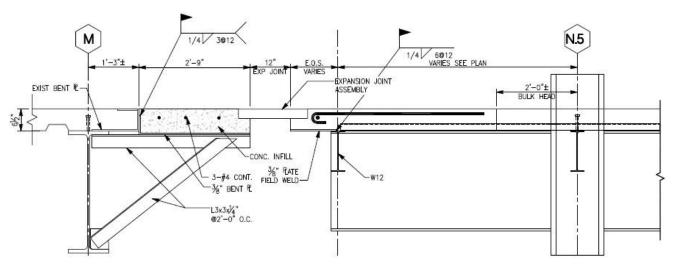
Expansion Joint Section Drawing Courtesy of JCJ Architecture
